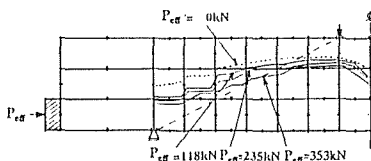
Position of Neutral Axis of Prestressed Concrete Beams
